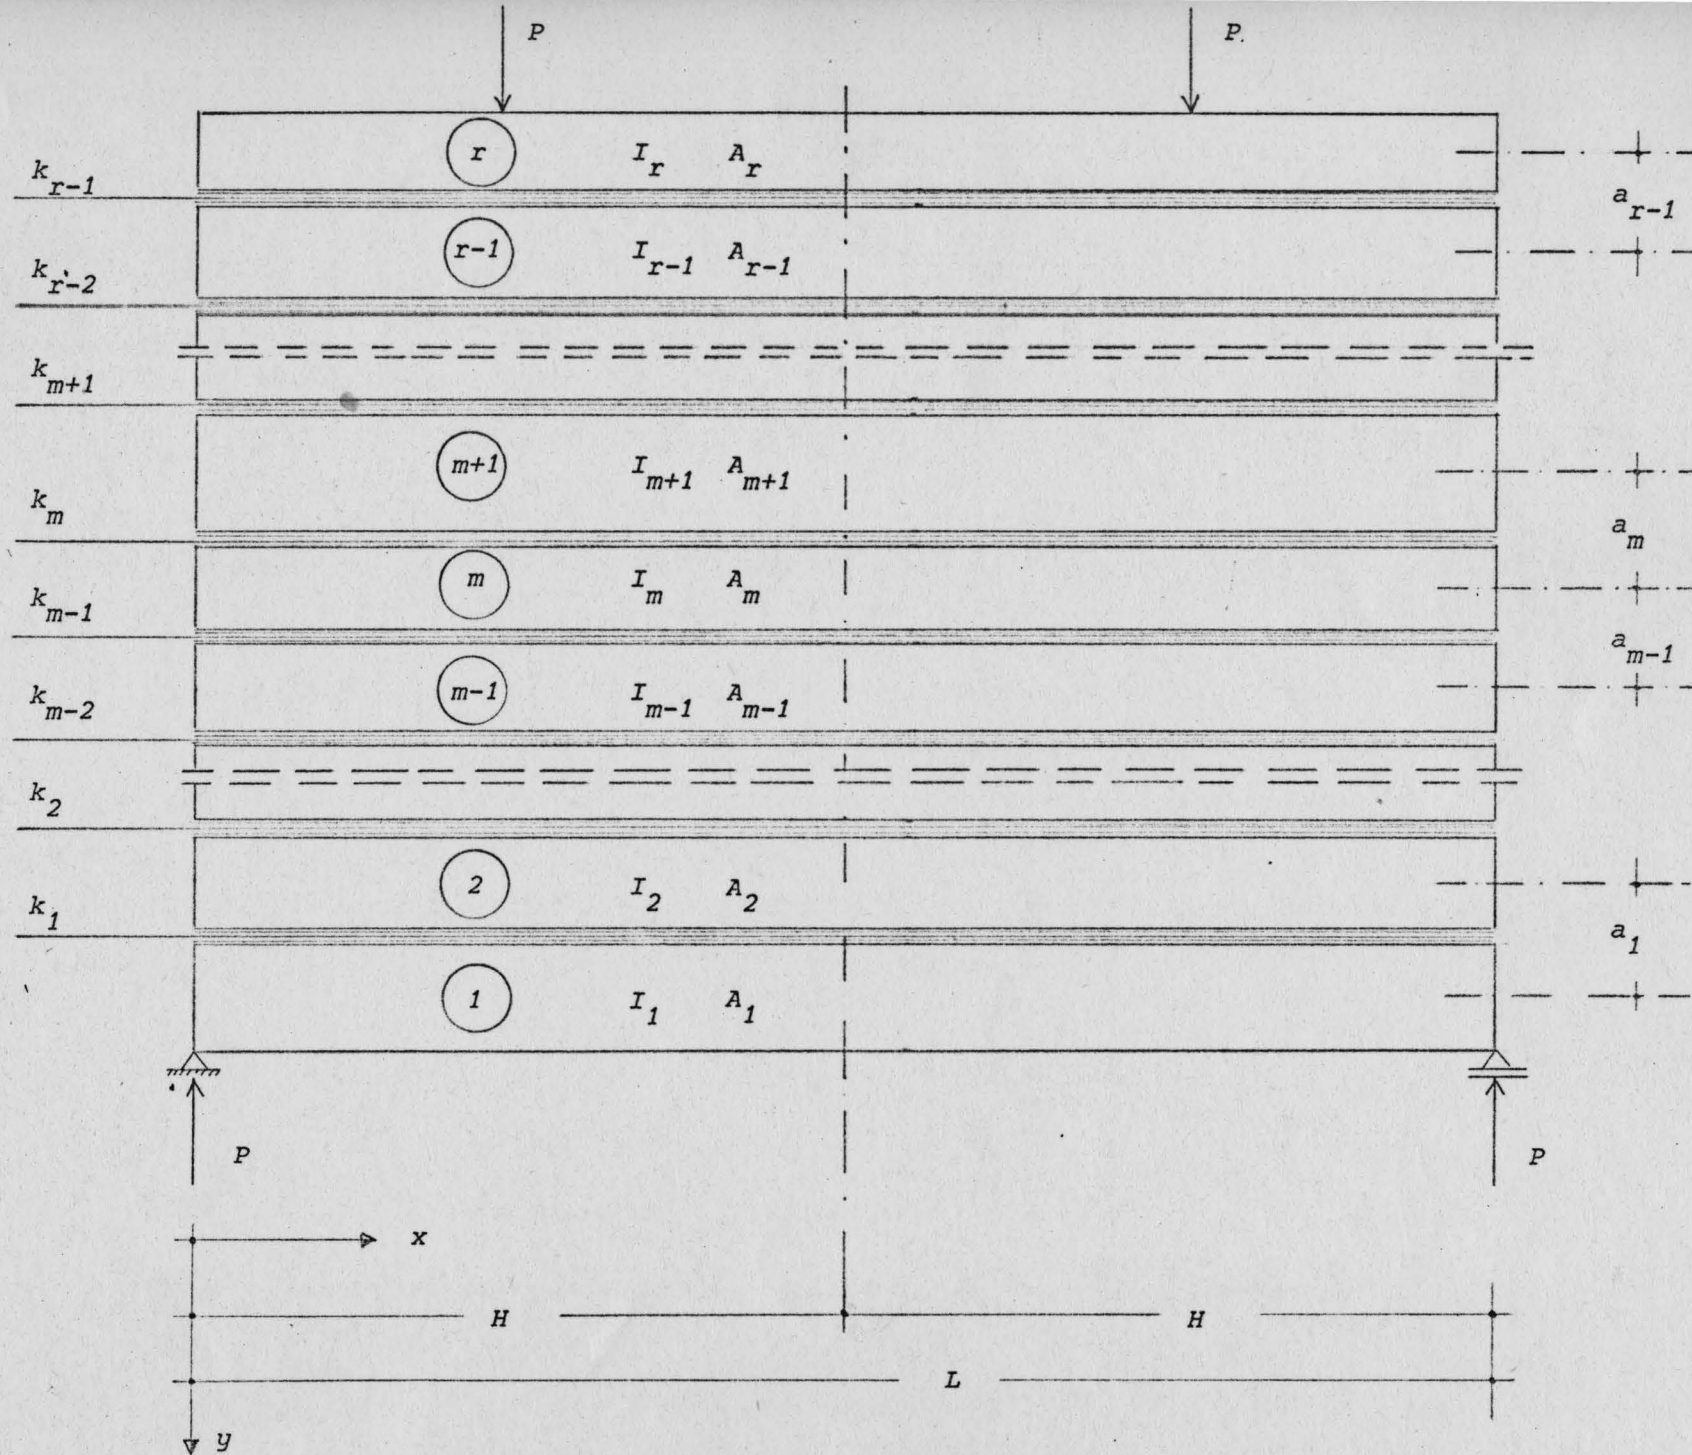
Multilayer sandwich beam under symmetrical loading
